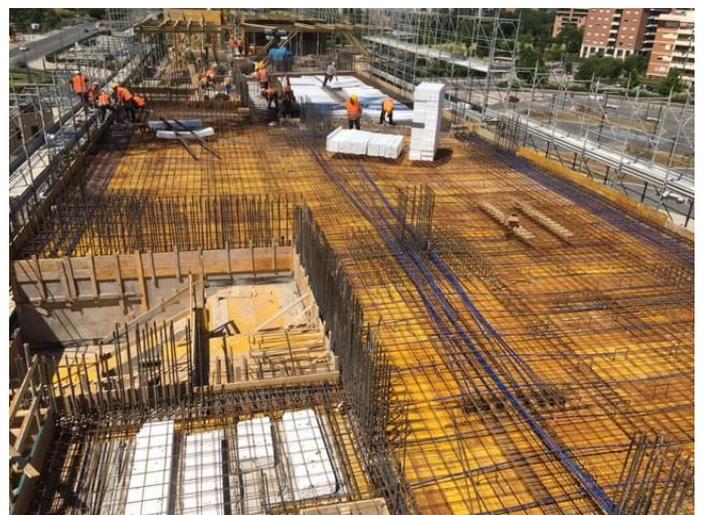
Building ENI 4: central post tensioned slab /Edificio ENI4 solaio centrale post teso.
